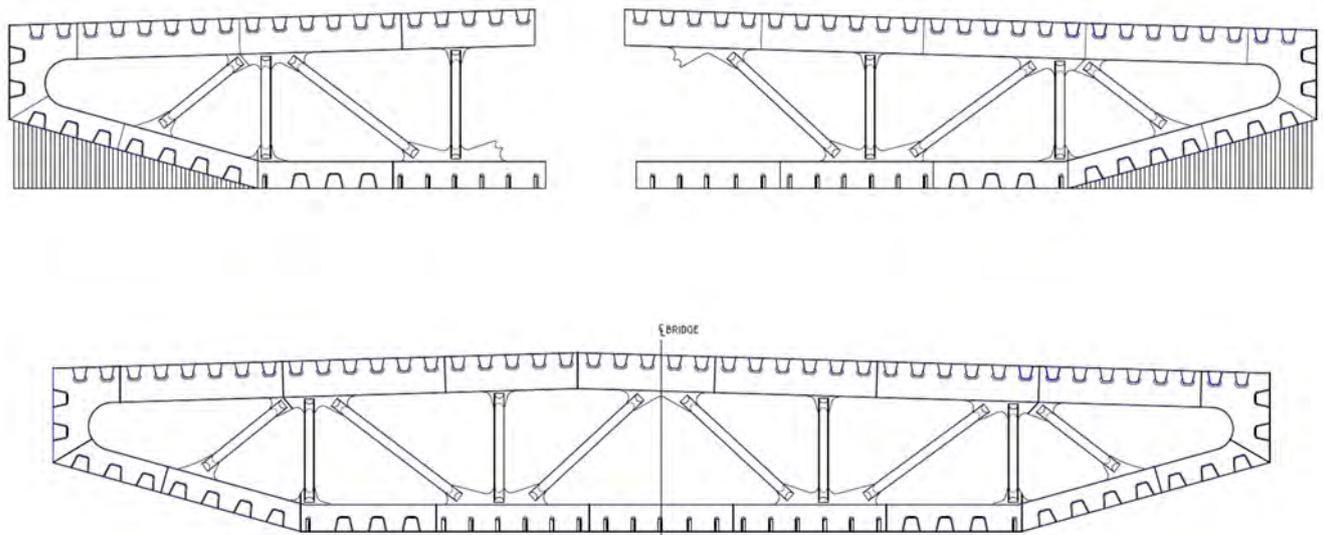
Assembly of entire Bridge Girder including back-welding
